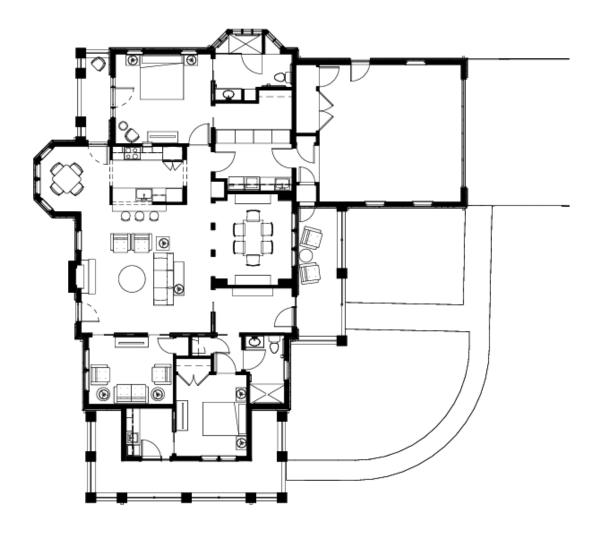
Floor plan of The House for Betty, Asbury Methodist Village, Gaithersburg, Maryland
